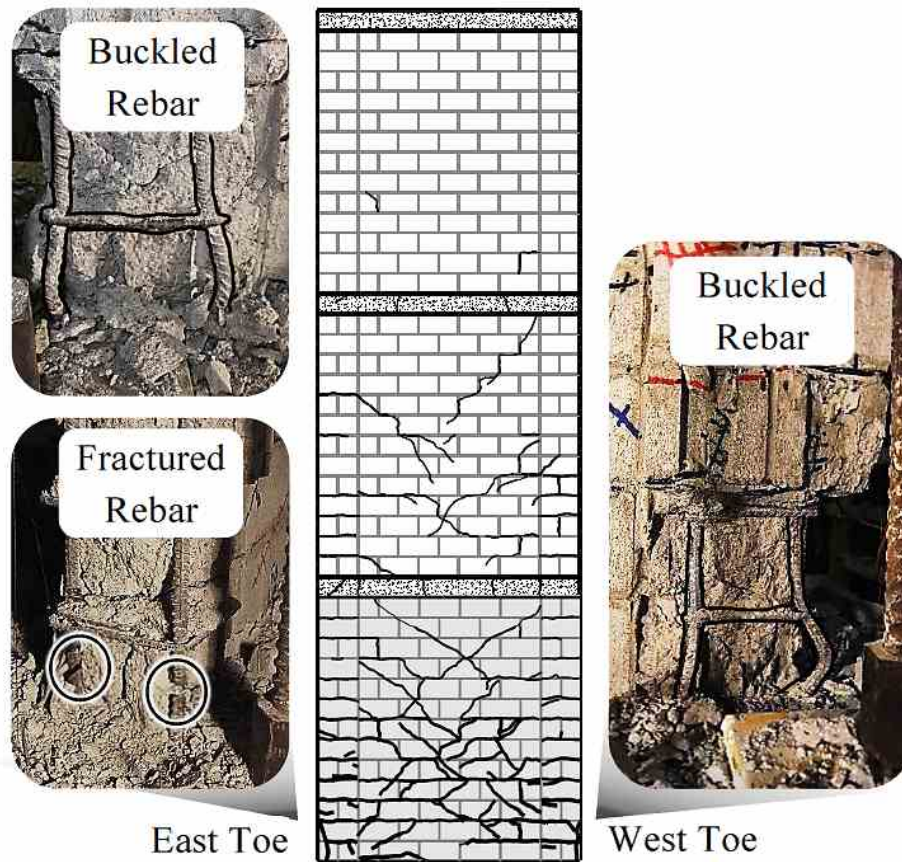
Crack Pattern and Failure Mechanisms of Wall 4
